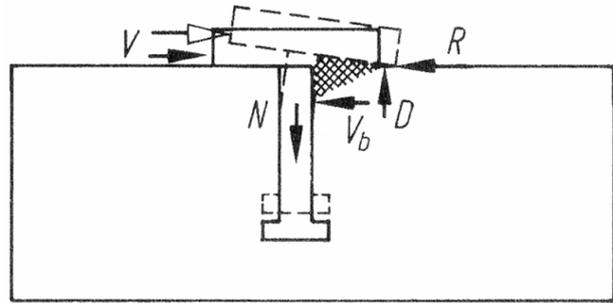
Supporting mechanism of a head bolt anchorage due to shear load (Eligehausen, Mallée & Silva 2006)
